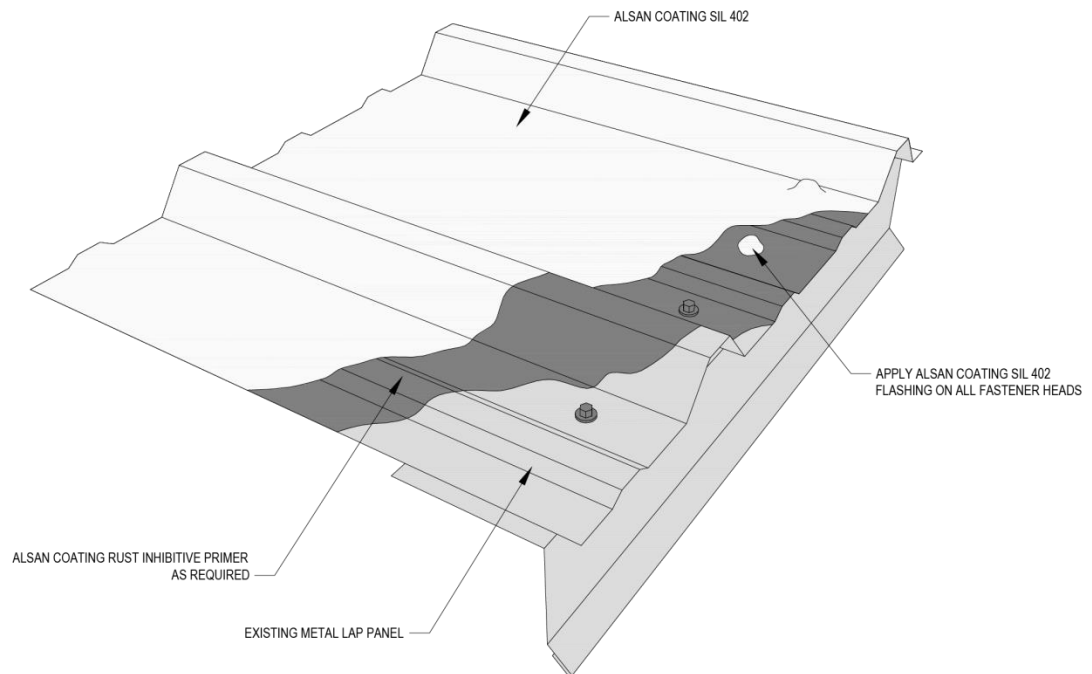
Silicone Roof Coating Over Metal Lap Panels, Edge
